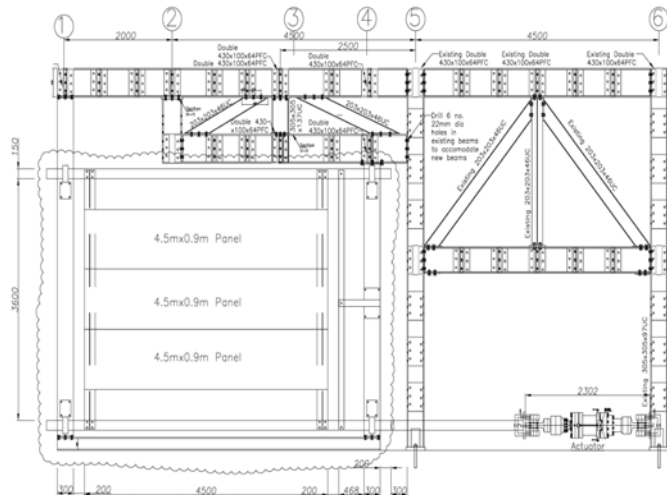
Test setup for the first option of proposed cladding testing frame at structure labs at NUIG.
